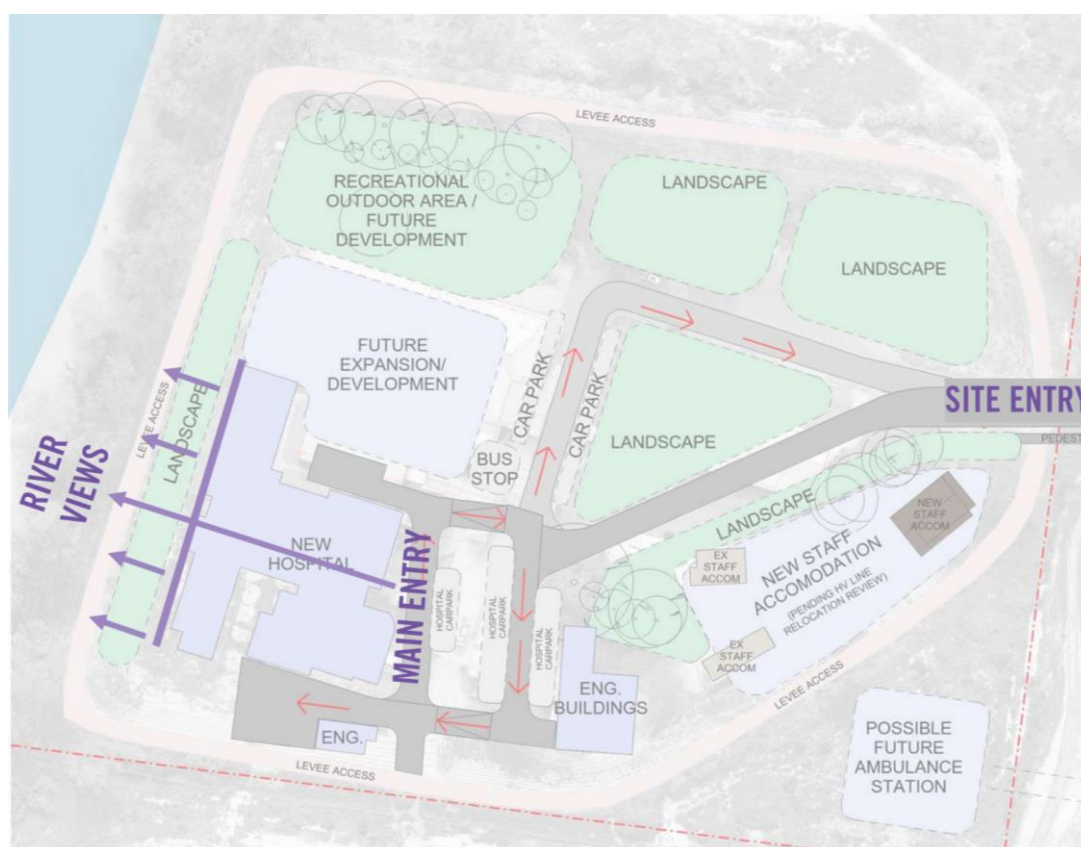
Site Plan in the initial Concept Design phase (NBRs)
